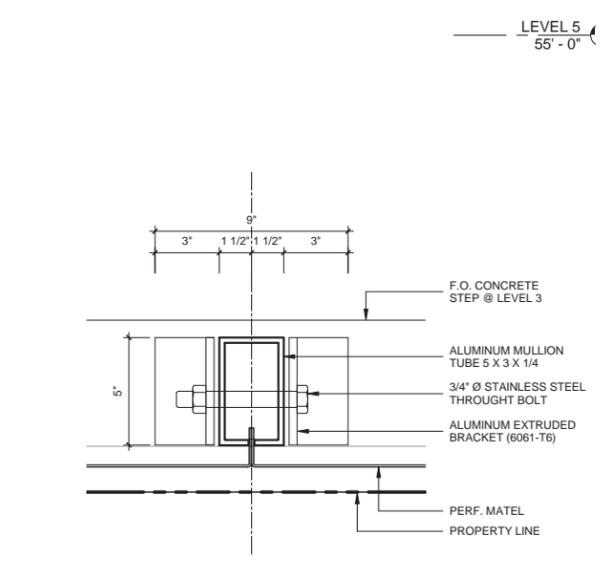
DETAIL SECTION @ SIDE ATTACHED 1 1/2" = 1'
